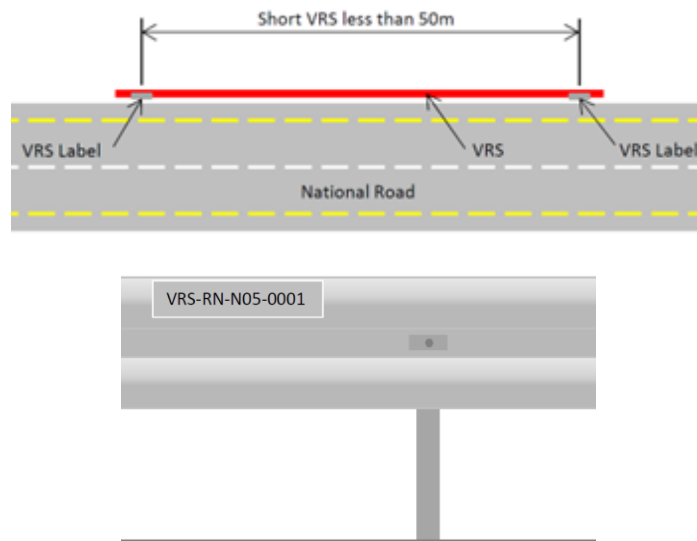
Example of labelling on short VRS (plan & elevation)
